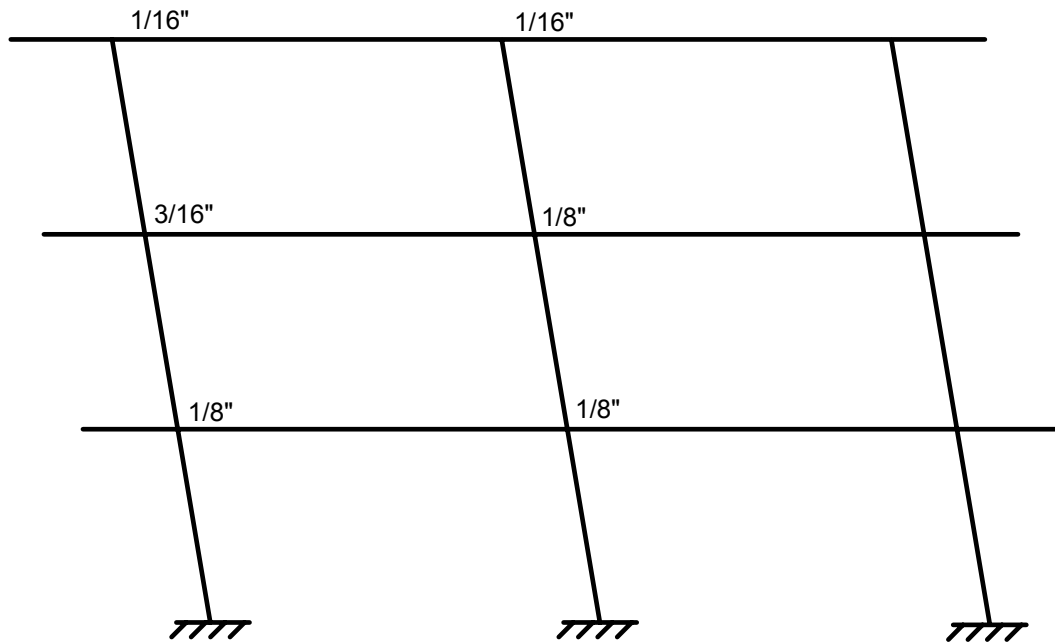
Flexural Crack Widths Frame A, South 3% Roof Drift
